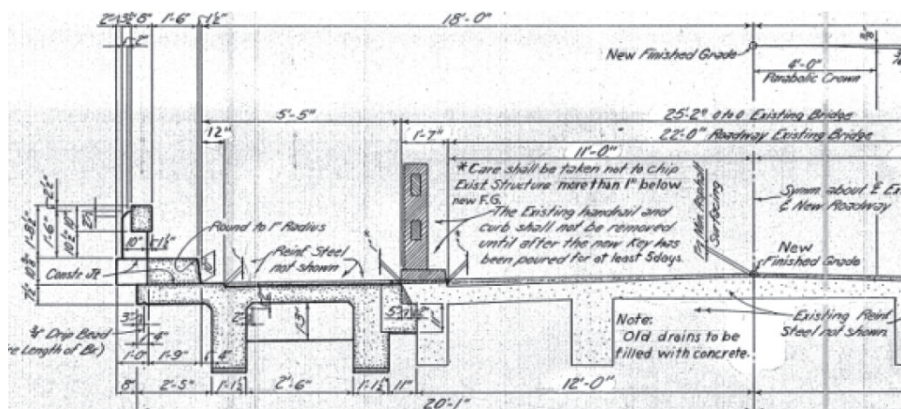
RC Tee-Beam Bridge with RC Tee-Beam Widening
